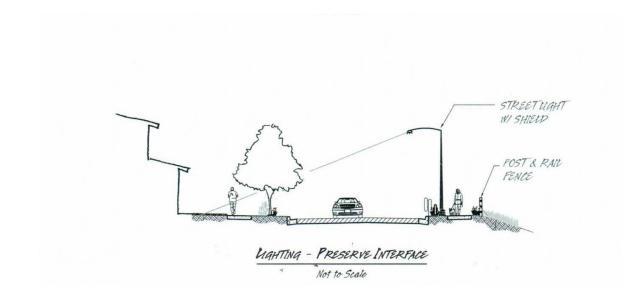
Conceptual Street Lighting Design Adjacent to RMP Preserve
